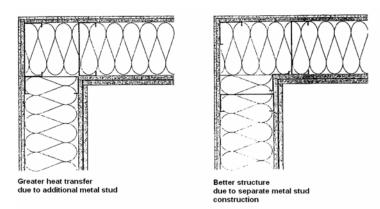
Superposition of a material heat bridge with a geometrical thermal bridge
